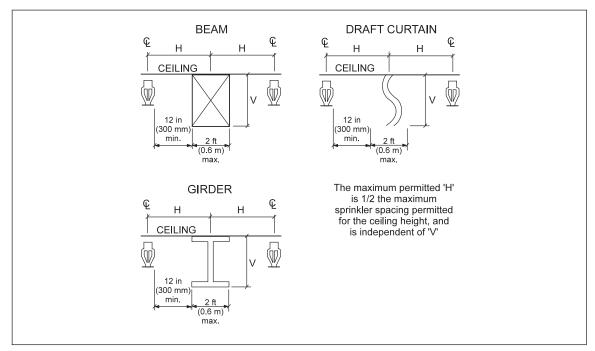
Installing Additional Sprinklers to Account for Obstructed Umbrella Discharge Pattern Caused by Solid Objects at Ceiling Level
